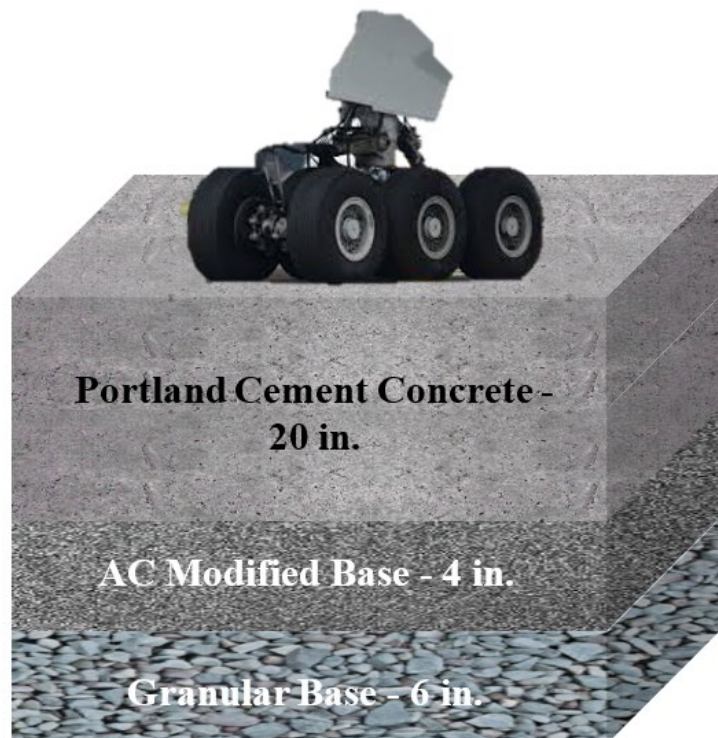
Cross Section of the Instrumented Taxiway (AC = Asphalt Concrete)
